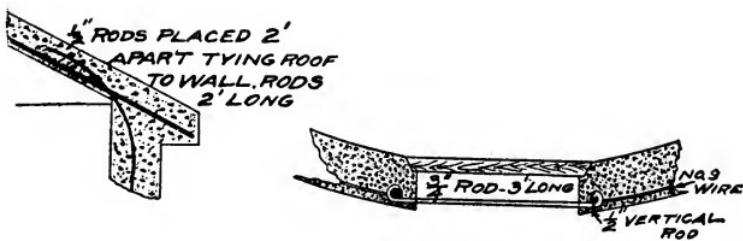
Showing method of tying roof to wall, and of reinforcing across door opening.
